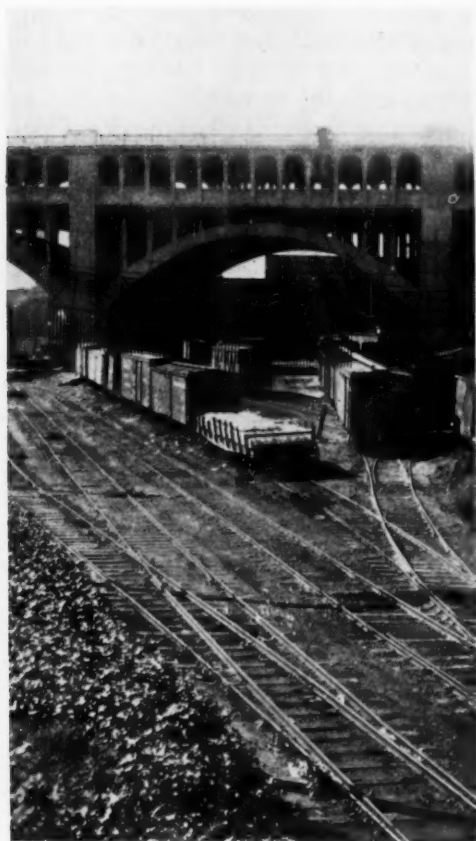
The Superior Street High Level Bridge. Trolley cars run on the lower bridge level, and the roadway is on the top. The switchman's house near the left pier gives an idea of the height of the bridge.
